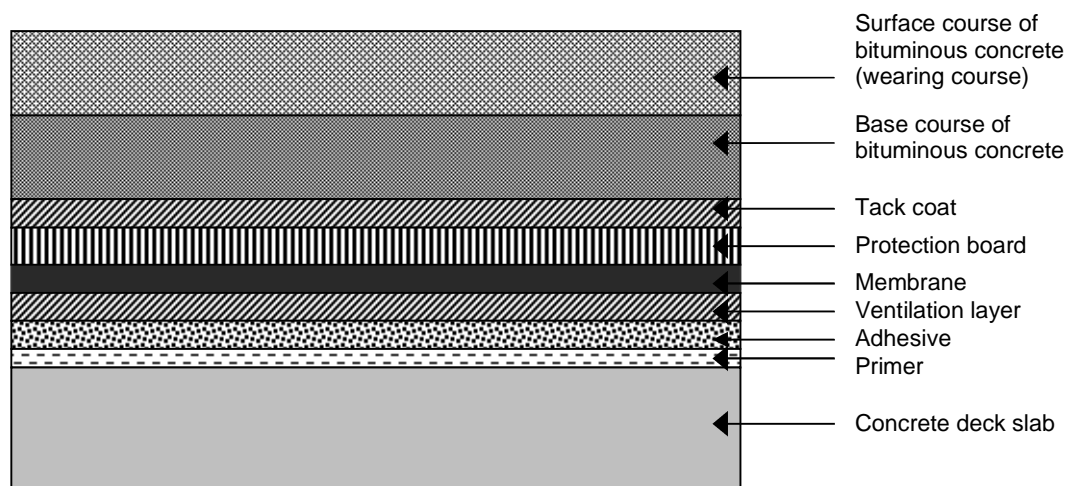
Schematic of possible components of a waterproofing system- (Broomfield, 2007 Page 126)
